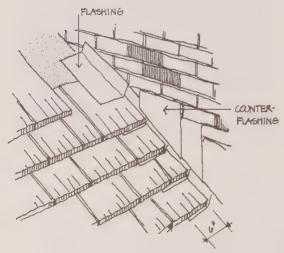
Flashing and Counter-flashing a Roof The Old House Journal, August 1977, p. 94.
